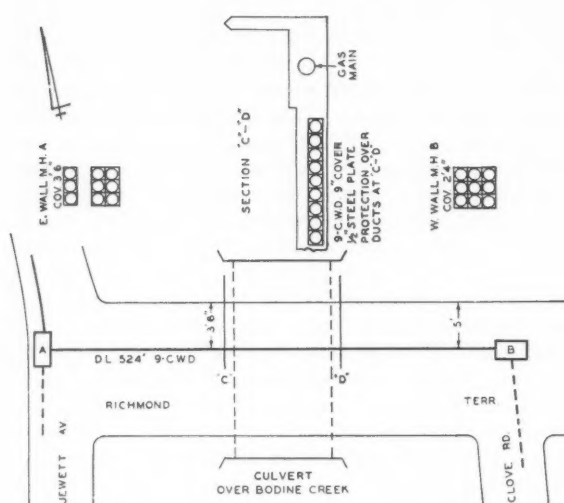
Duct arrangement on Richmond Terrace between Jewett Ave. and Clove Road.
